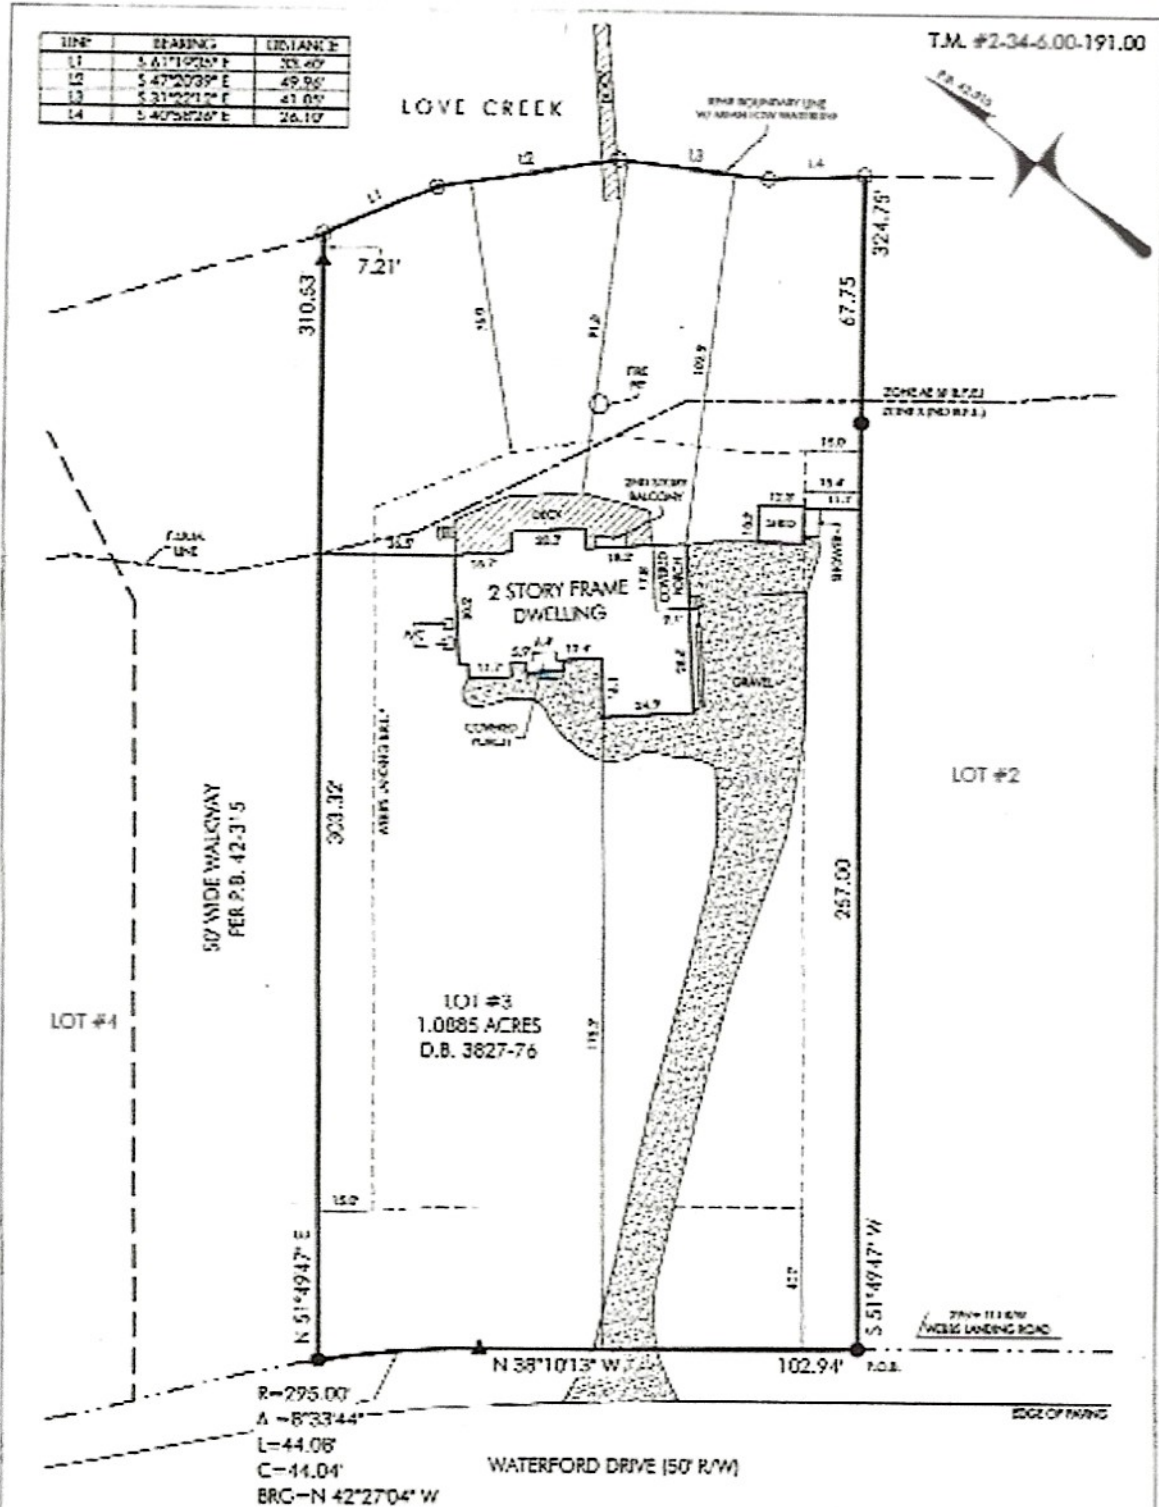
Plan view and cross-section sketches of proposed project. Sketches for permit application purposes only.
